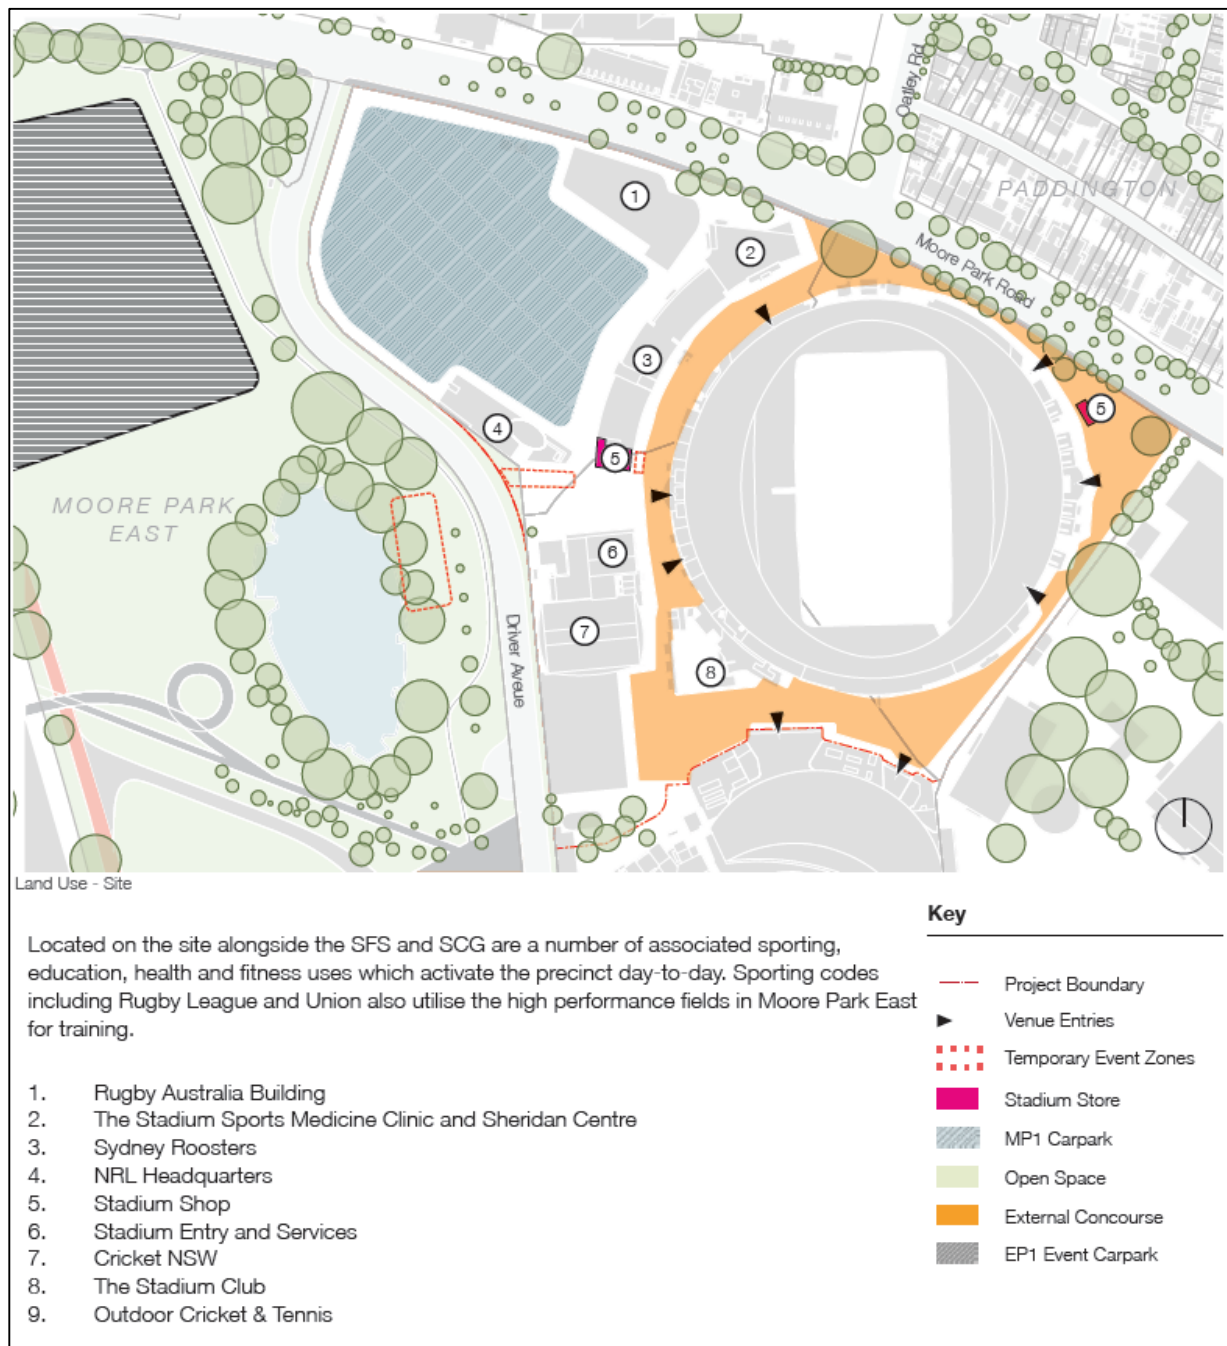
EXISTING SITE PLAN (SOURCE: SJB ARCHITECTS, URBAN DESIGN GUIDELINES: 46)
